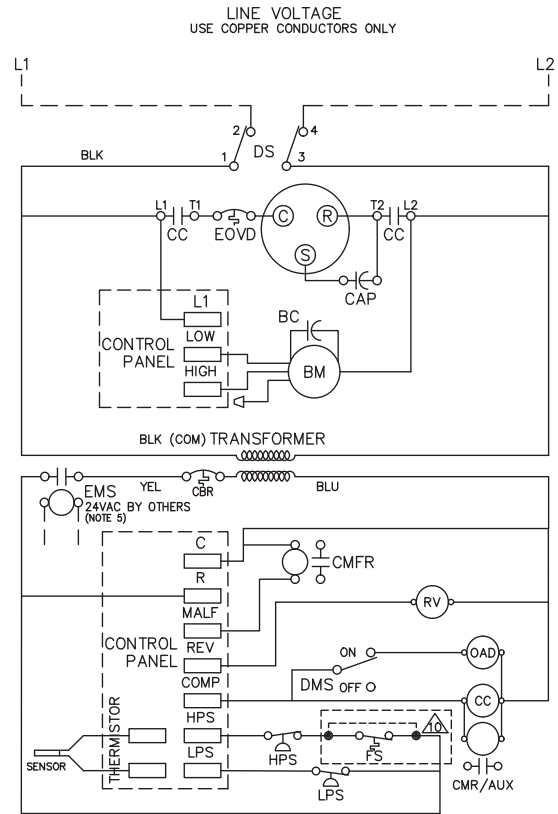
Wiring Diagram with Unit Mounted Controller
